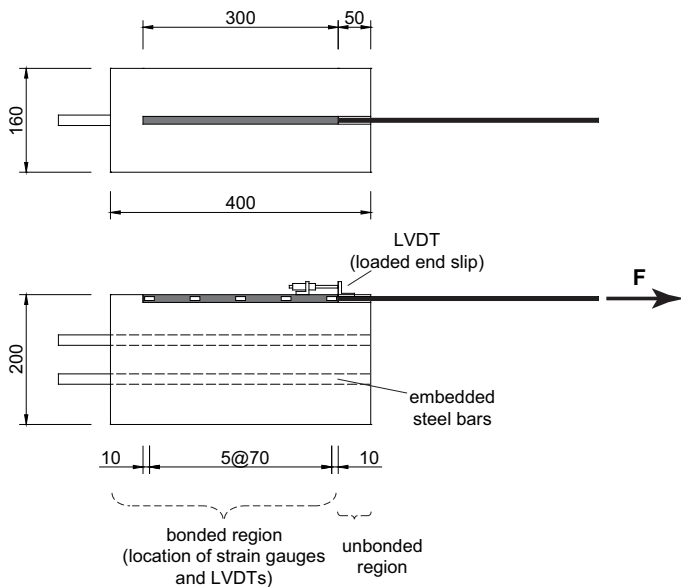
Typical test setup for single shear tests (SS) on NSM.
